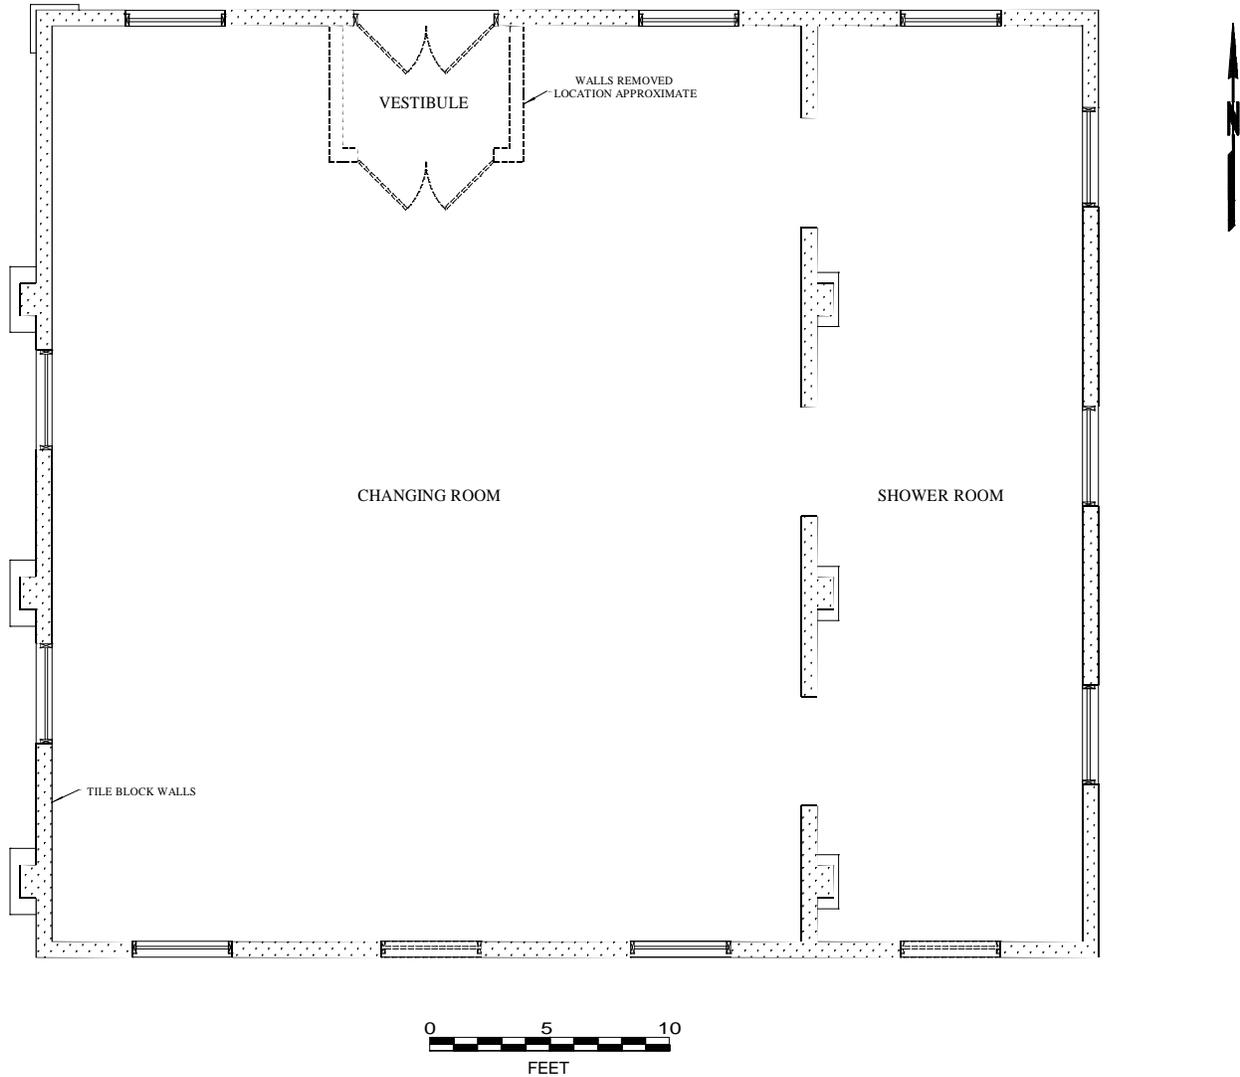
Plan view of the wash house (Feature 7) at the Cherry Mine. This figure illustrates the building as originally constructed. Dashed lines indicate conjectural window openings and approximate wall locations (FRR 2002).
